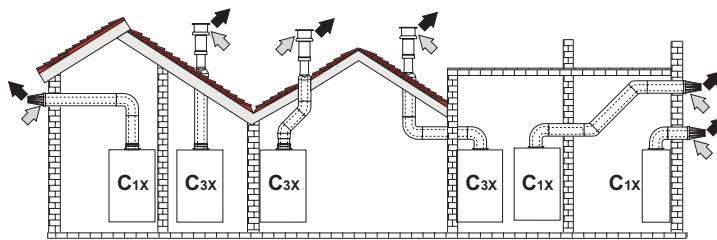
Examples of connection with coaxial pipes (➡ = Air / ➡ = Fumes)
